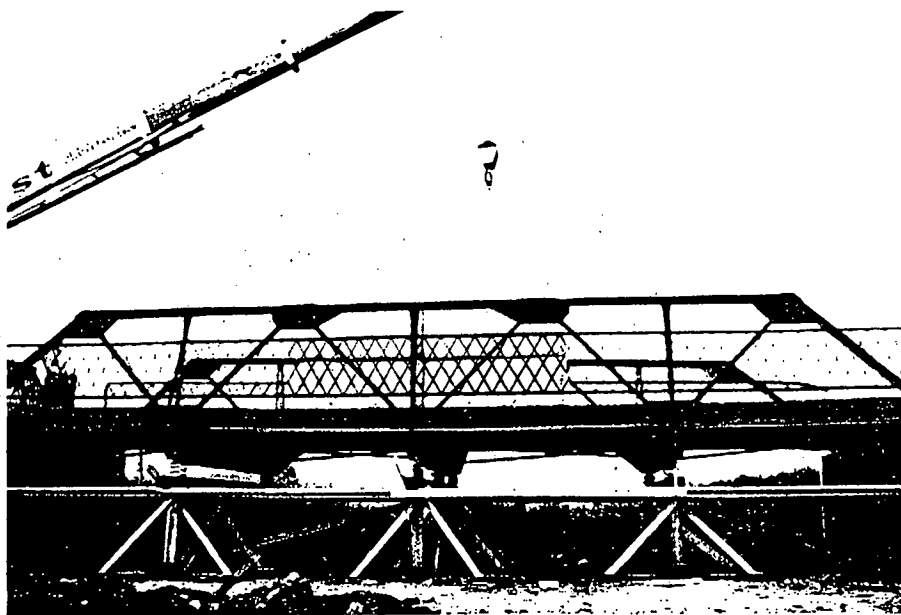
Concrete blocks used for load testing a bridge. Note safety scaffolding underneath the bridge.
